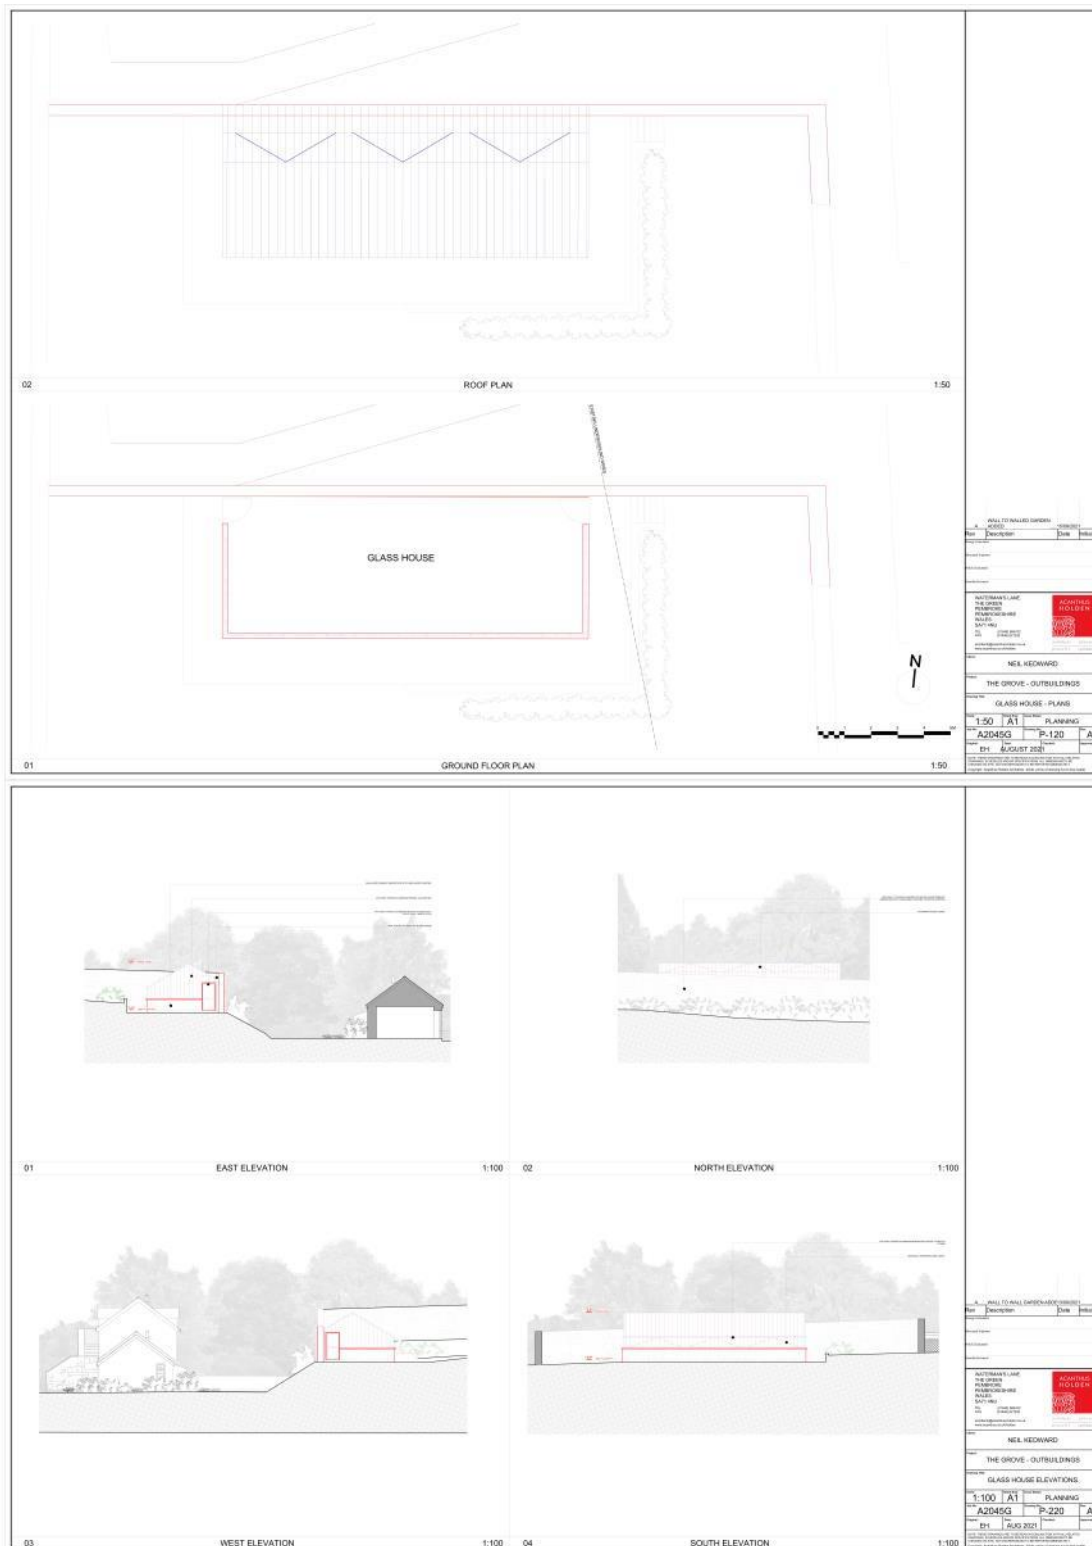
Plans and elevations of the proposed glasshouse. Plans provided by the client as part of the planning application (21/0617/PA), not reproduced to scale.
